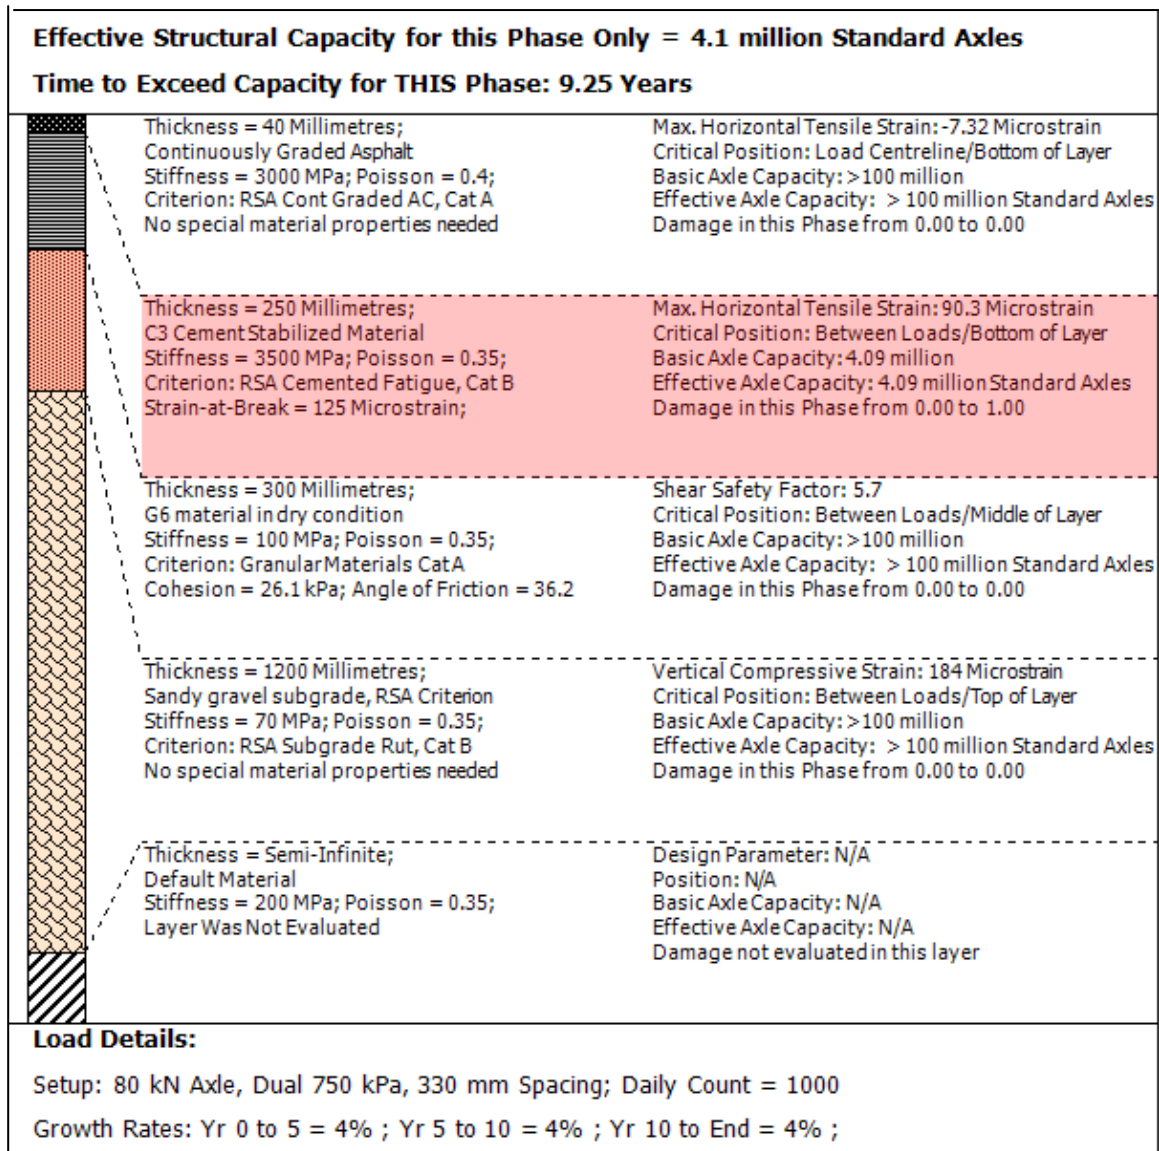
Structural capacity evaluation of amended pavement structure.
